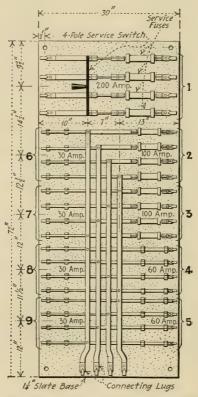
General-power cabinet—Cabinet "C"—for Indiana Theatre, Terre Haute, Ind. (Frank Adam Electric Co.) This is the shop drawing made by the switchboard manufacturer based on electrical engineers sketch, Fig. 552.
